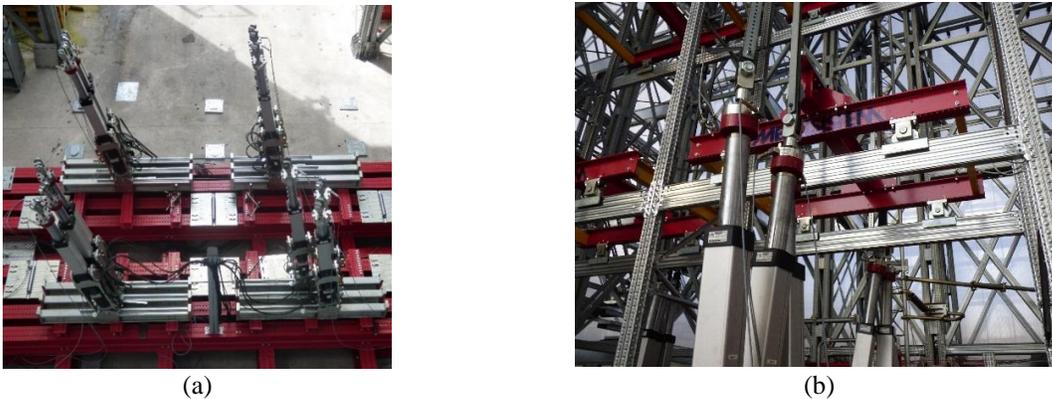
The testing tower: external view and detail of a specimen in the tower [12]
